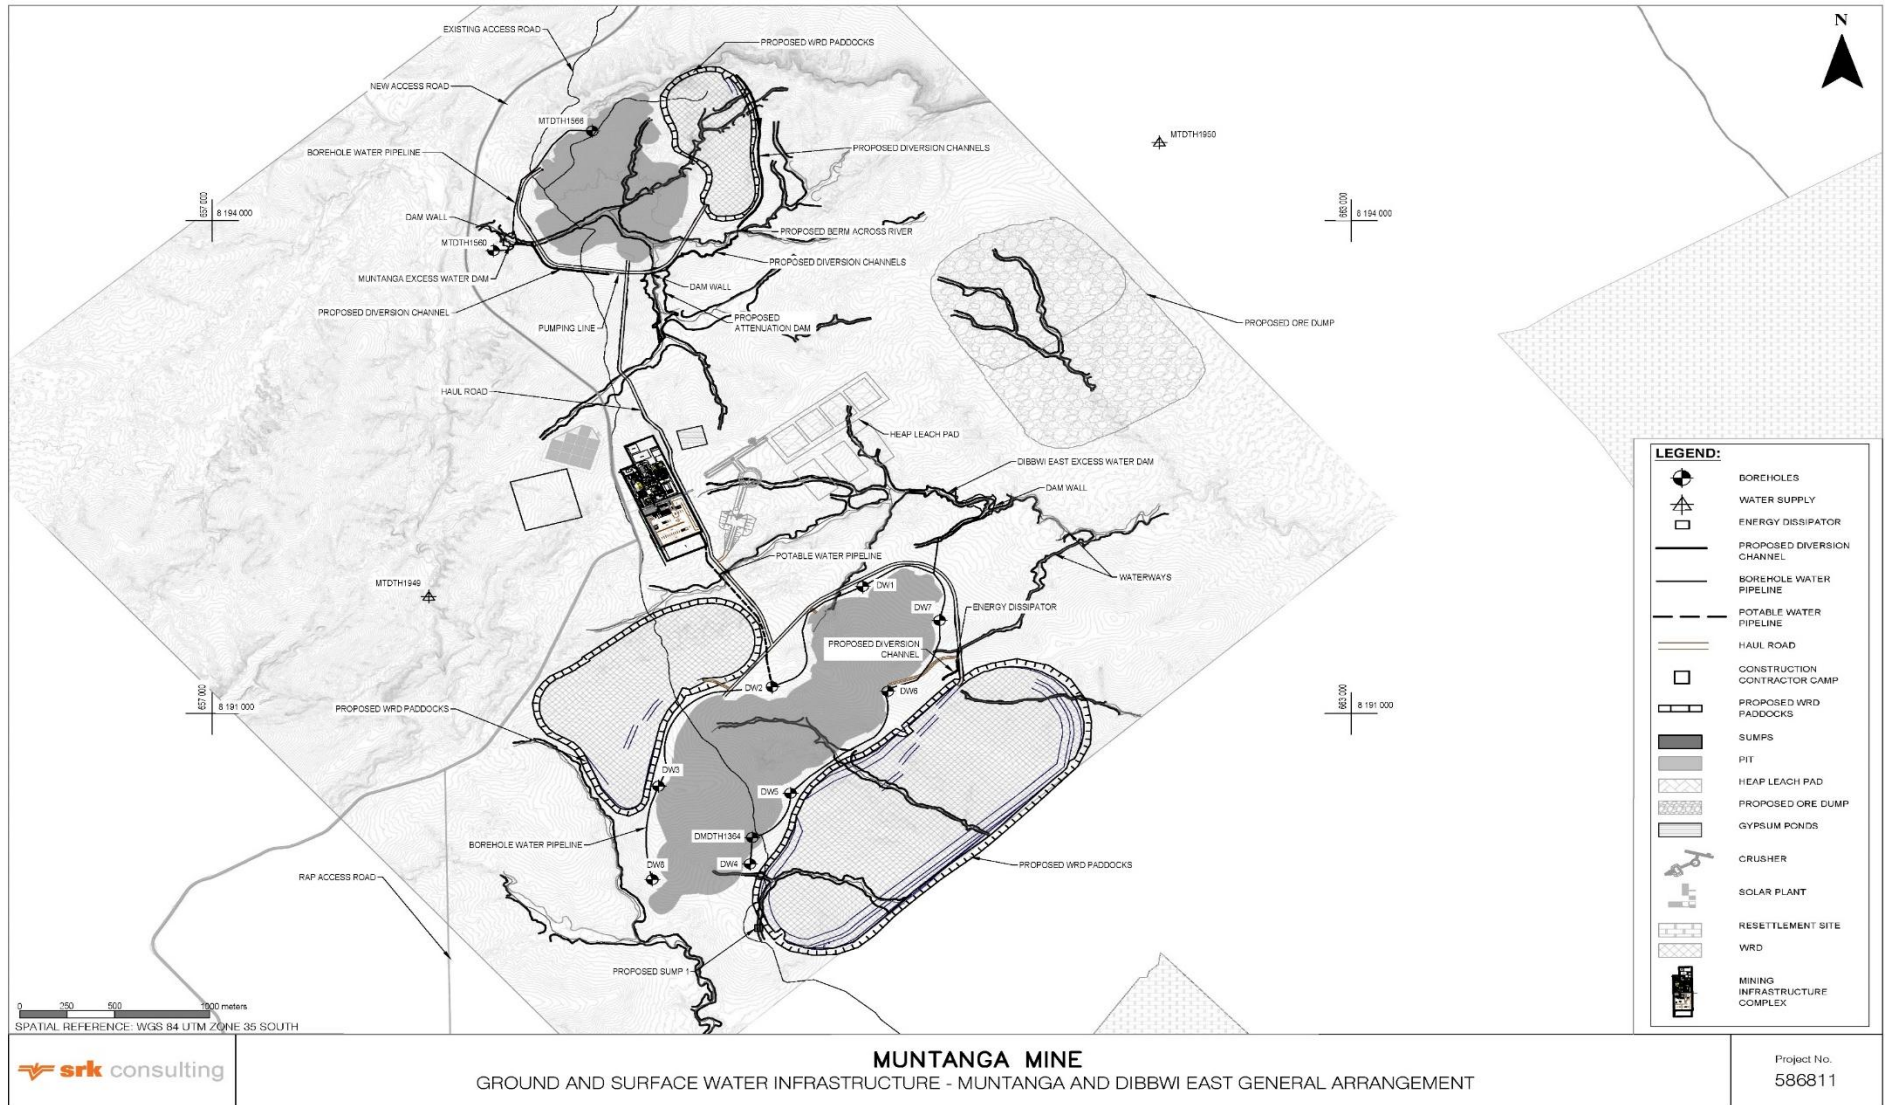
Ground and surface water infrastructure - Muntanga and Dibbi East general arrangement layout
